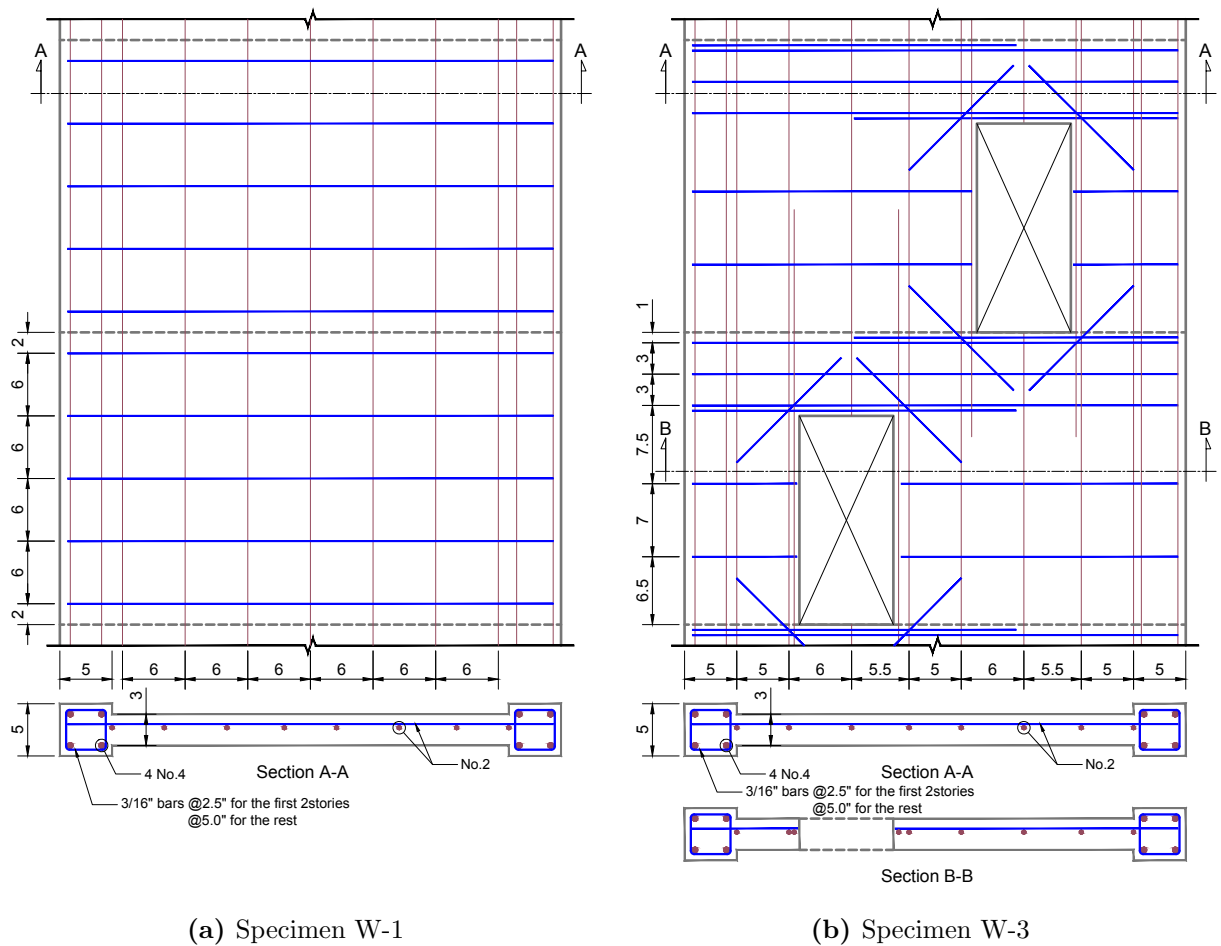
Dimensions of wall specimens tested by Ali and Wight (units in inches).
